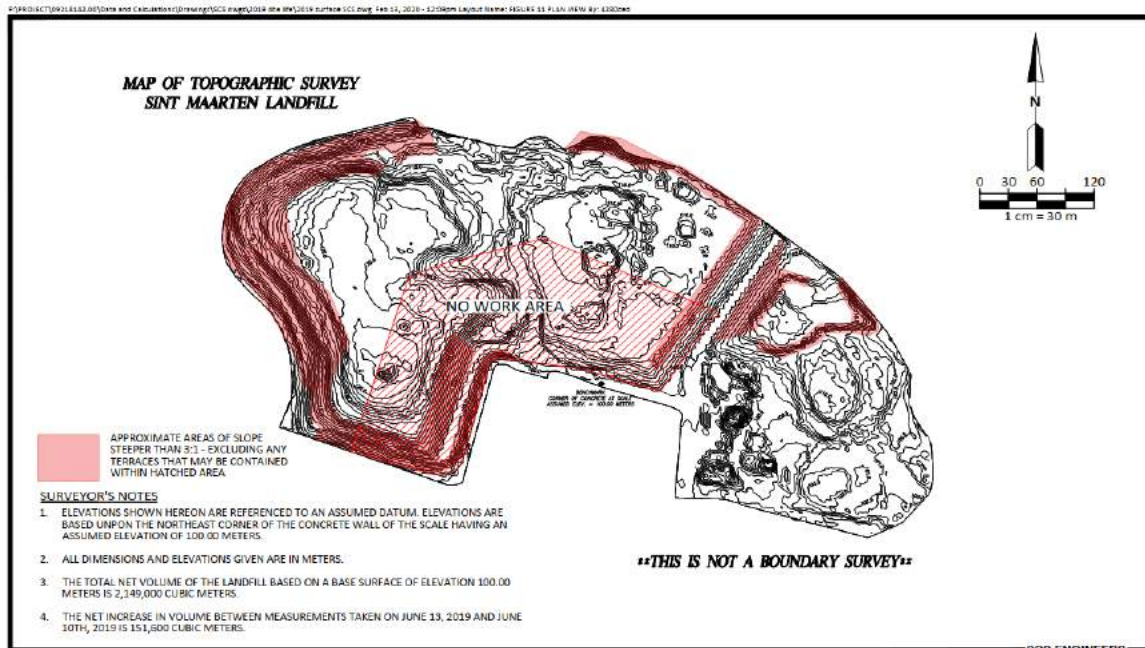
SINT MAARTEN POND ISLAND LANDFILL CROSS SECTIONS PLAN
